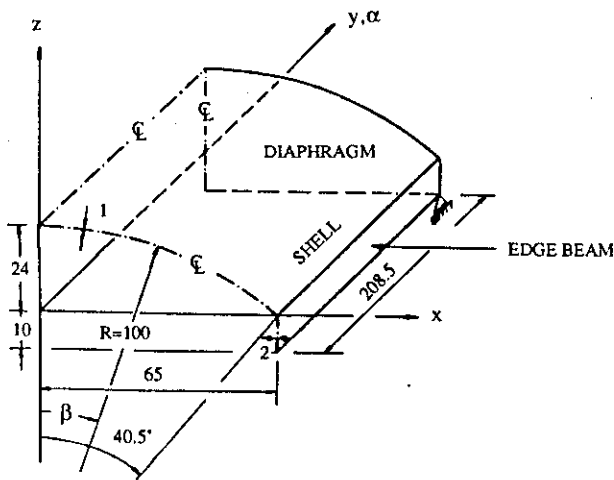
Ex. 2. Prestressed Cylindrical Shell Geometry. (All dimensions in cm)
